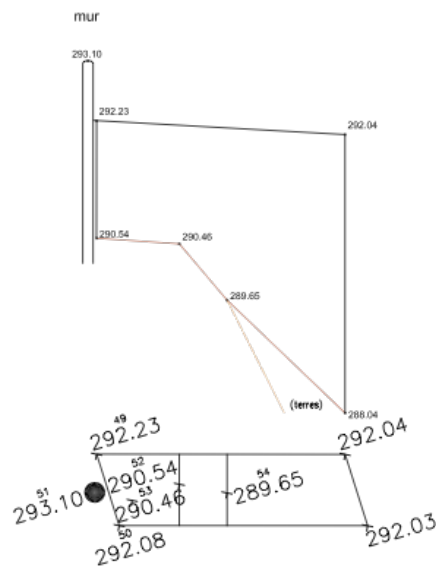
Pit 11 on the key of Arch 7 (b) Cross section of Pit 11
